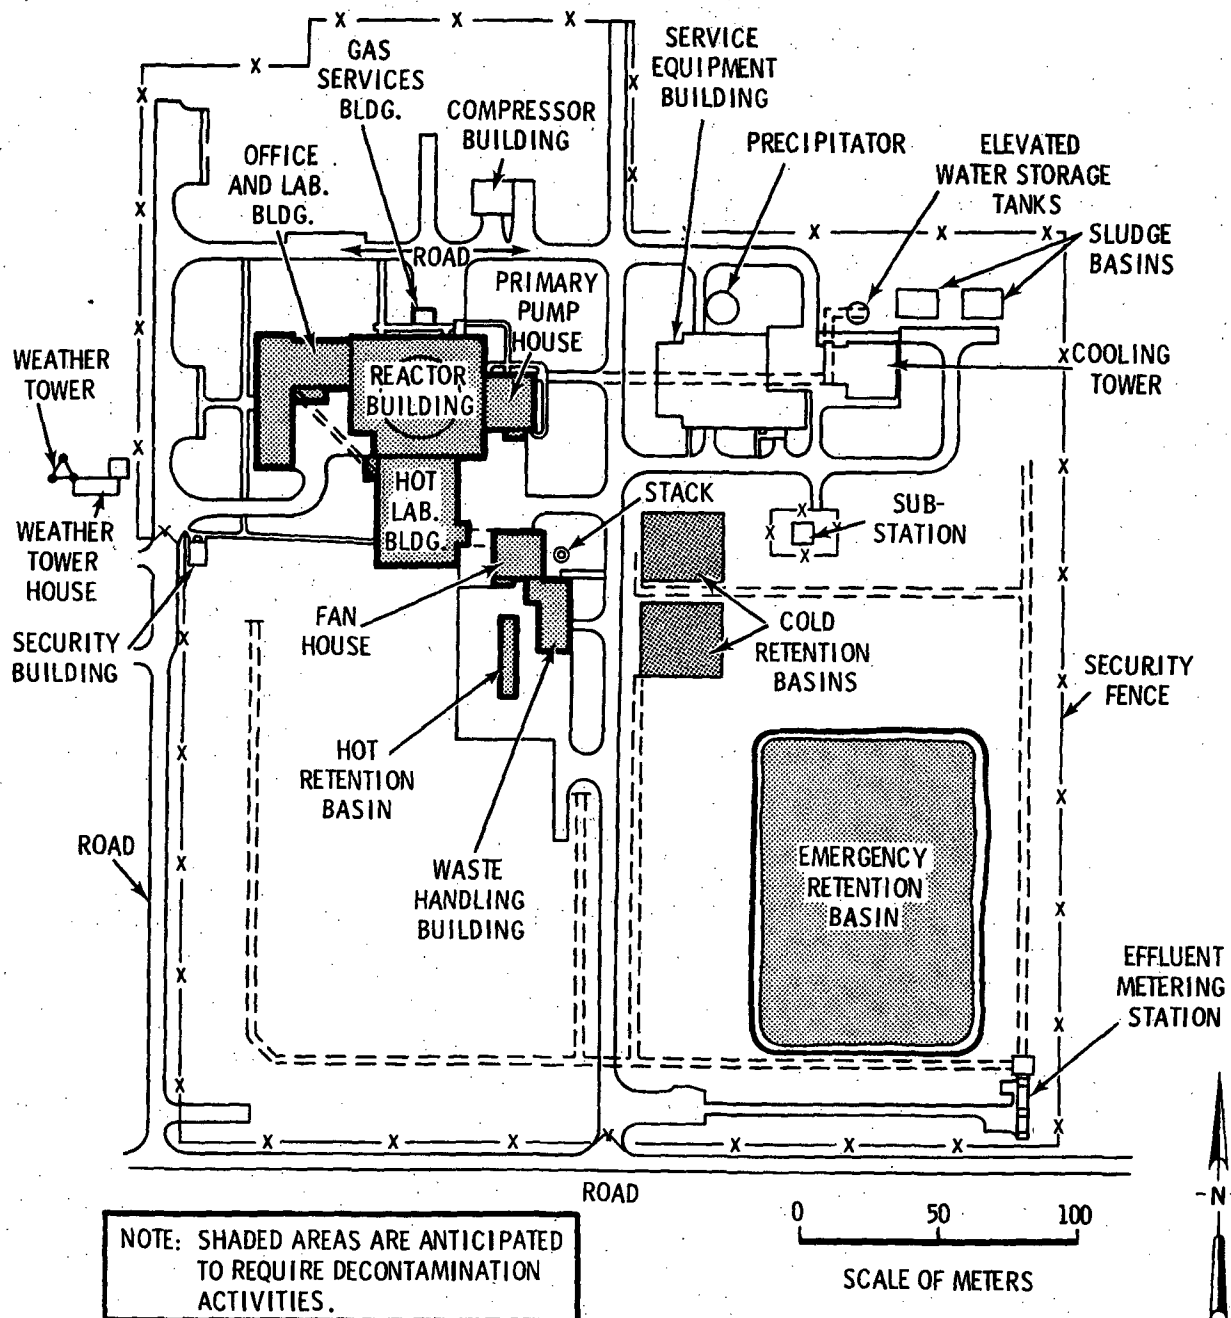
Site Layout of the Reference Test Reactor Facilities
